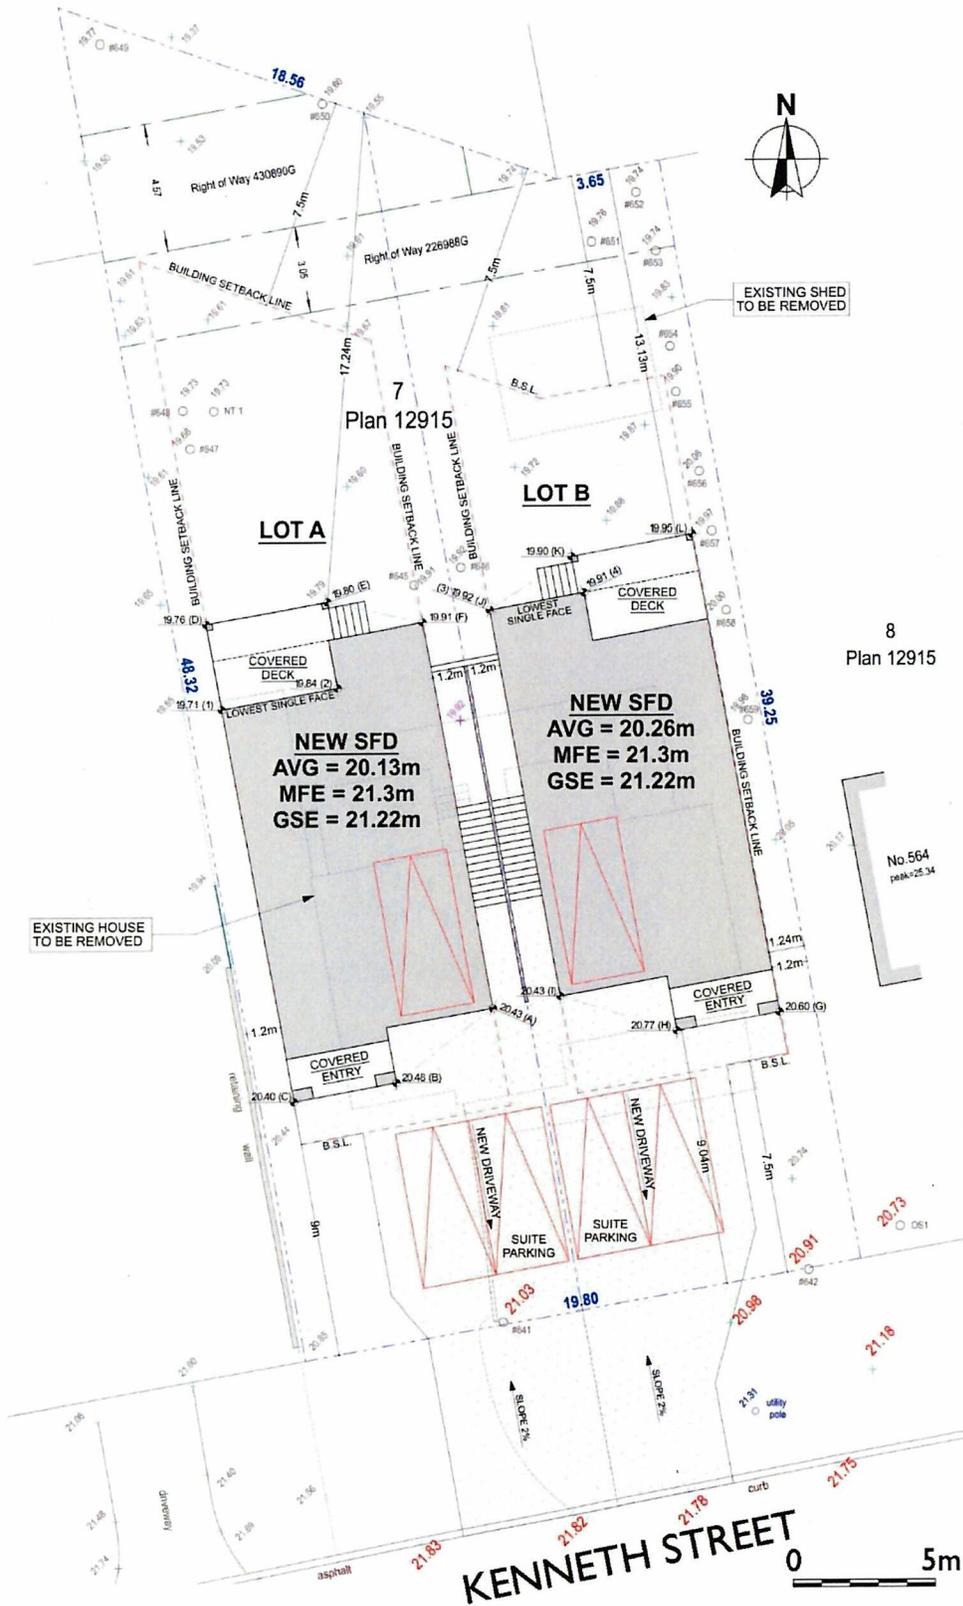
Proposed Subdivision (from plans by Adapt Design)
